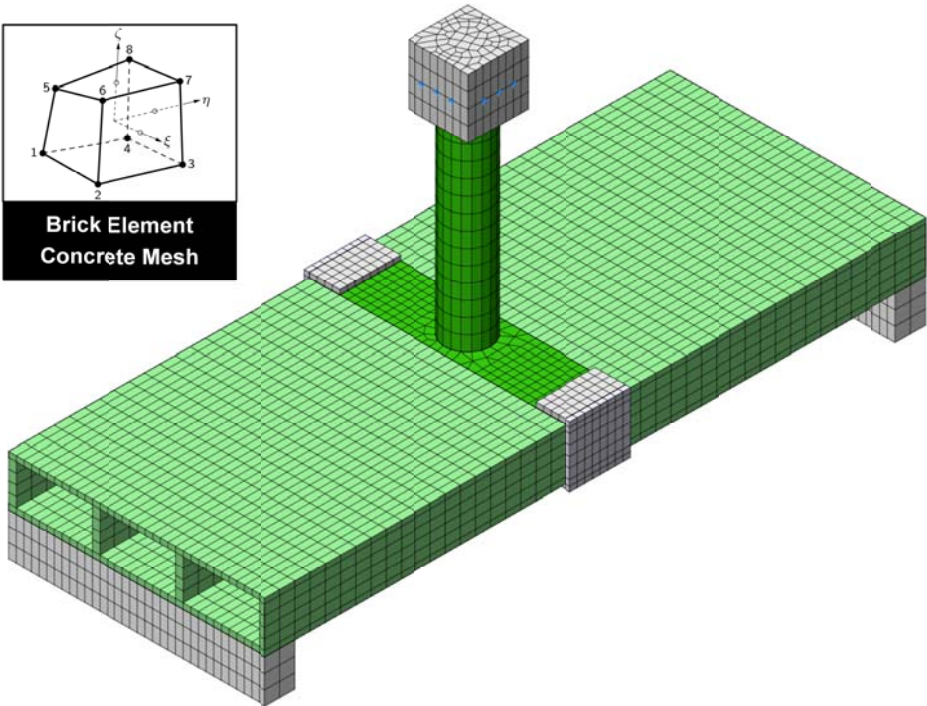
DIANA brick-element concrete mesh used for modeling the test specimen subassembly
